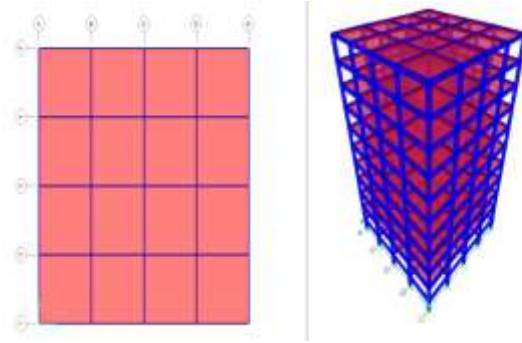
Plan and 3D view of symmetric G+9 building in SAP2000
